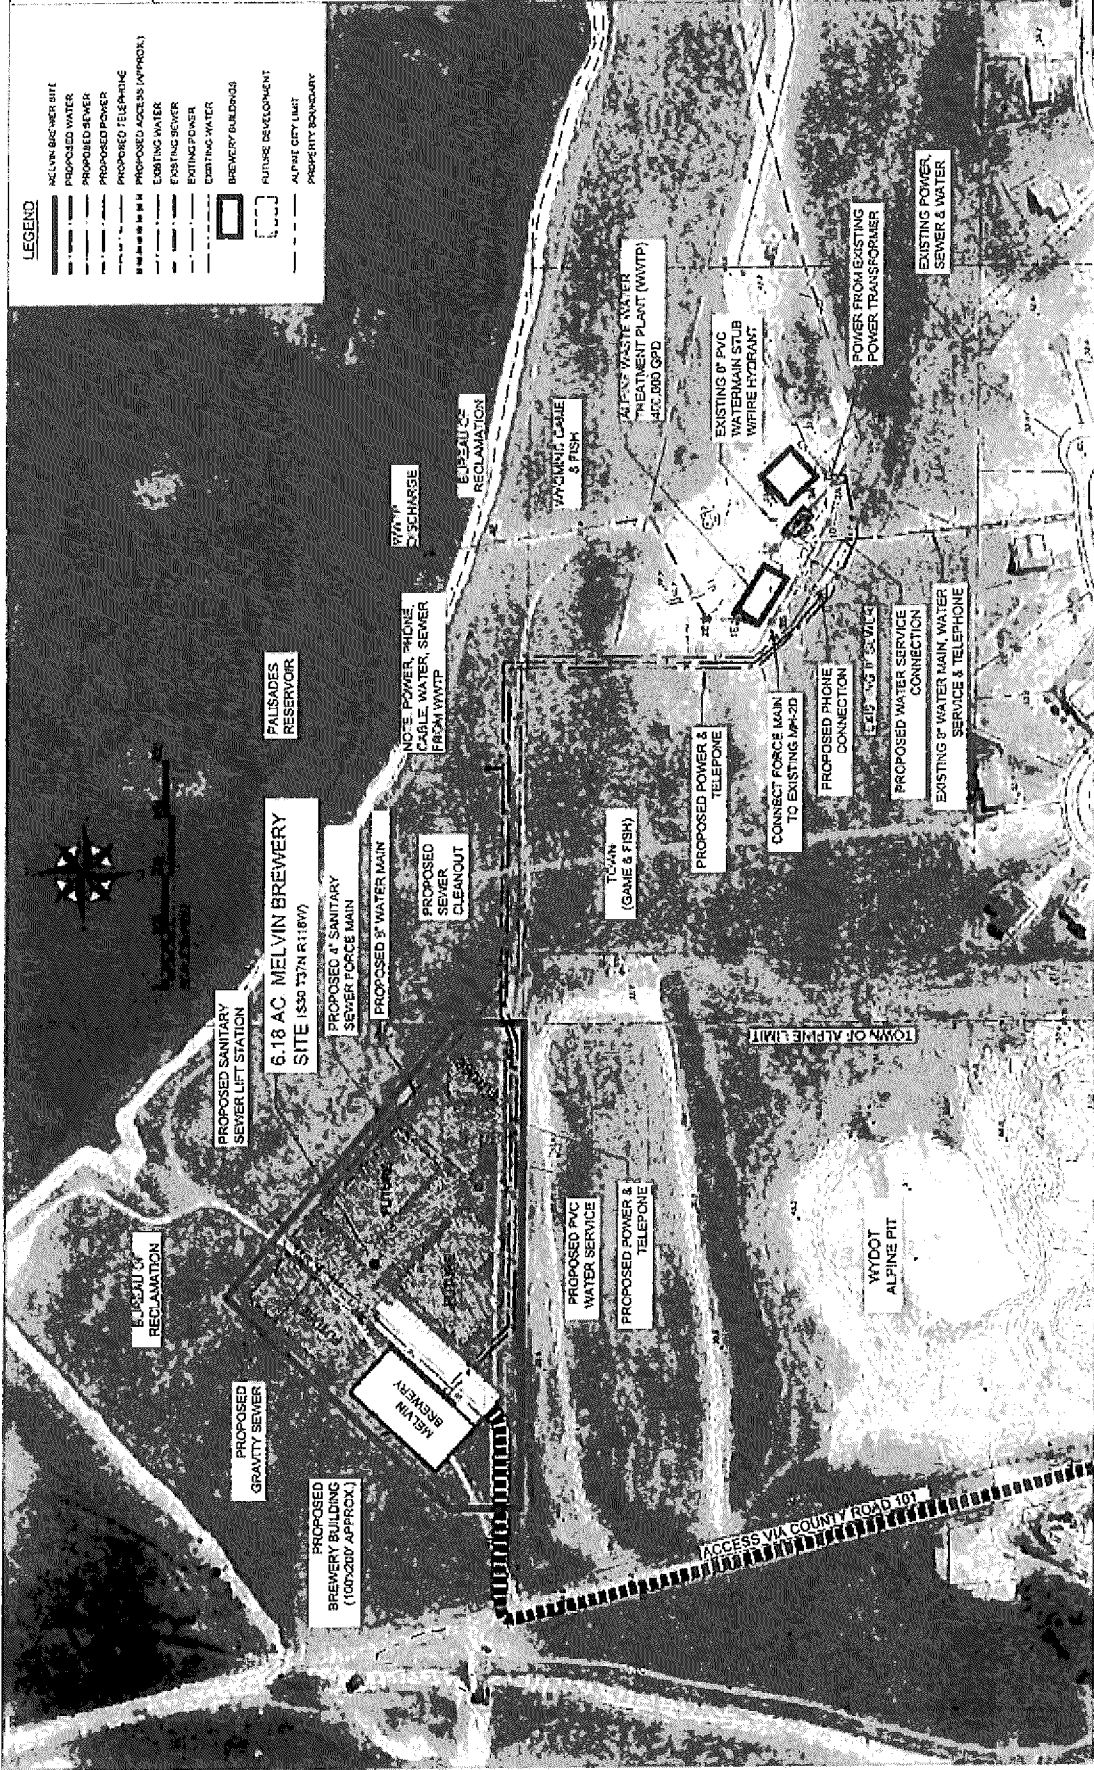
PLANS AND SPECIFICATIONS FOR BREWERY BUILDING
